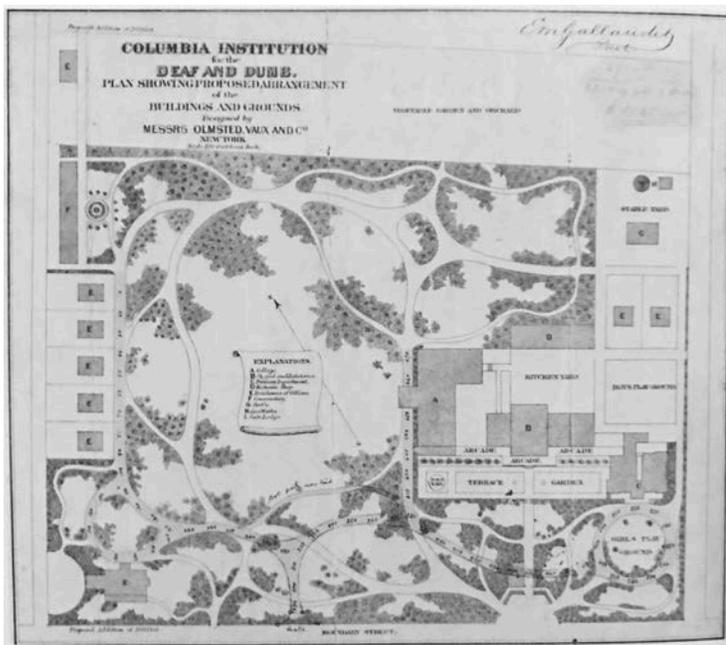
Campus Plan proposed by Frederick Law Olmsted in 1866 (Armstrong, 26).
